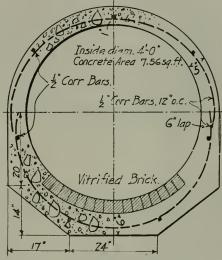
REINFORCED CONCRETE, PORTLAND, ORE.
